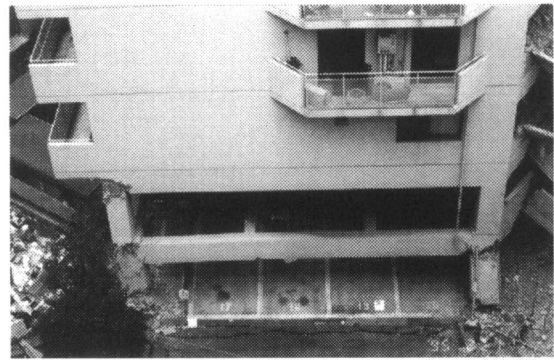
Actual damage between the ground and second floor joint and the second and third floor joint
